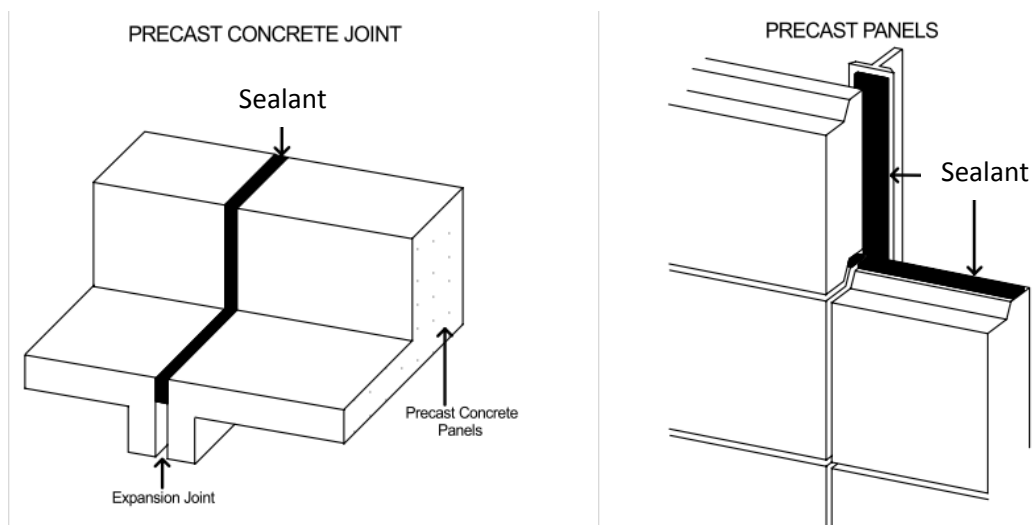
Sealant seals a joint by adhering to appropriate surfaces within the joint.
